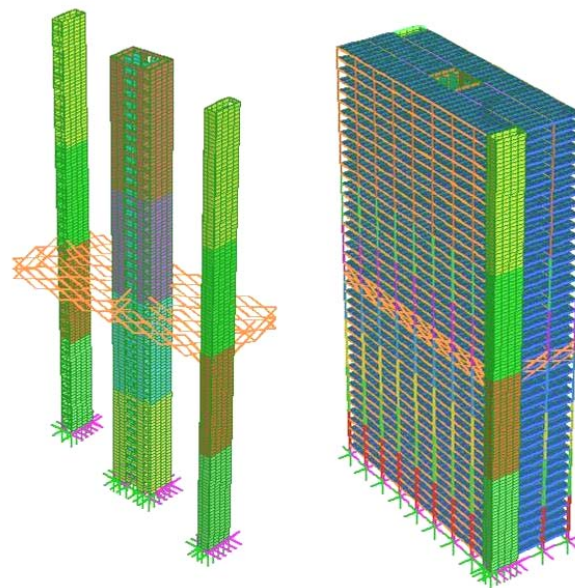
Rectangular Model Elevation (Shear Wall and Full Model)
